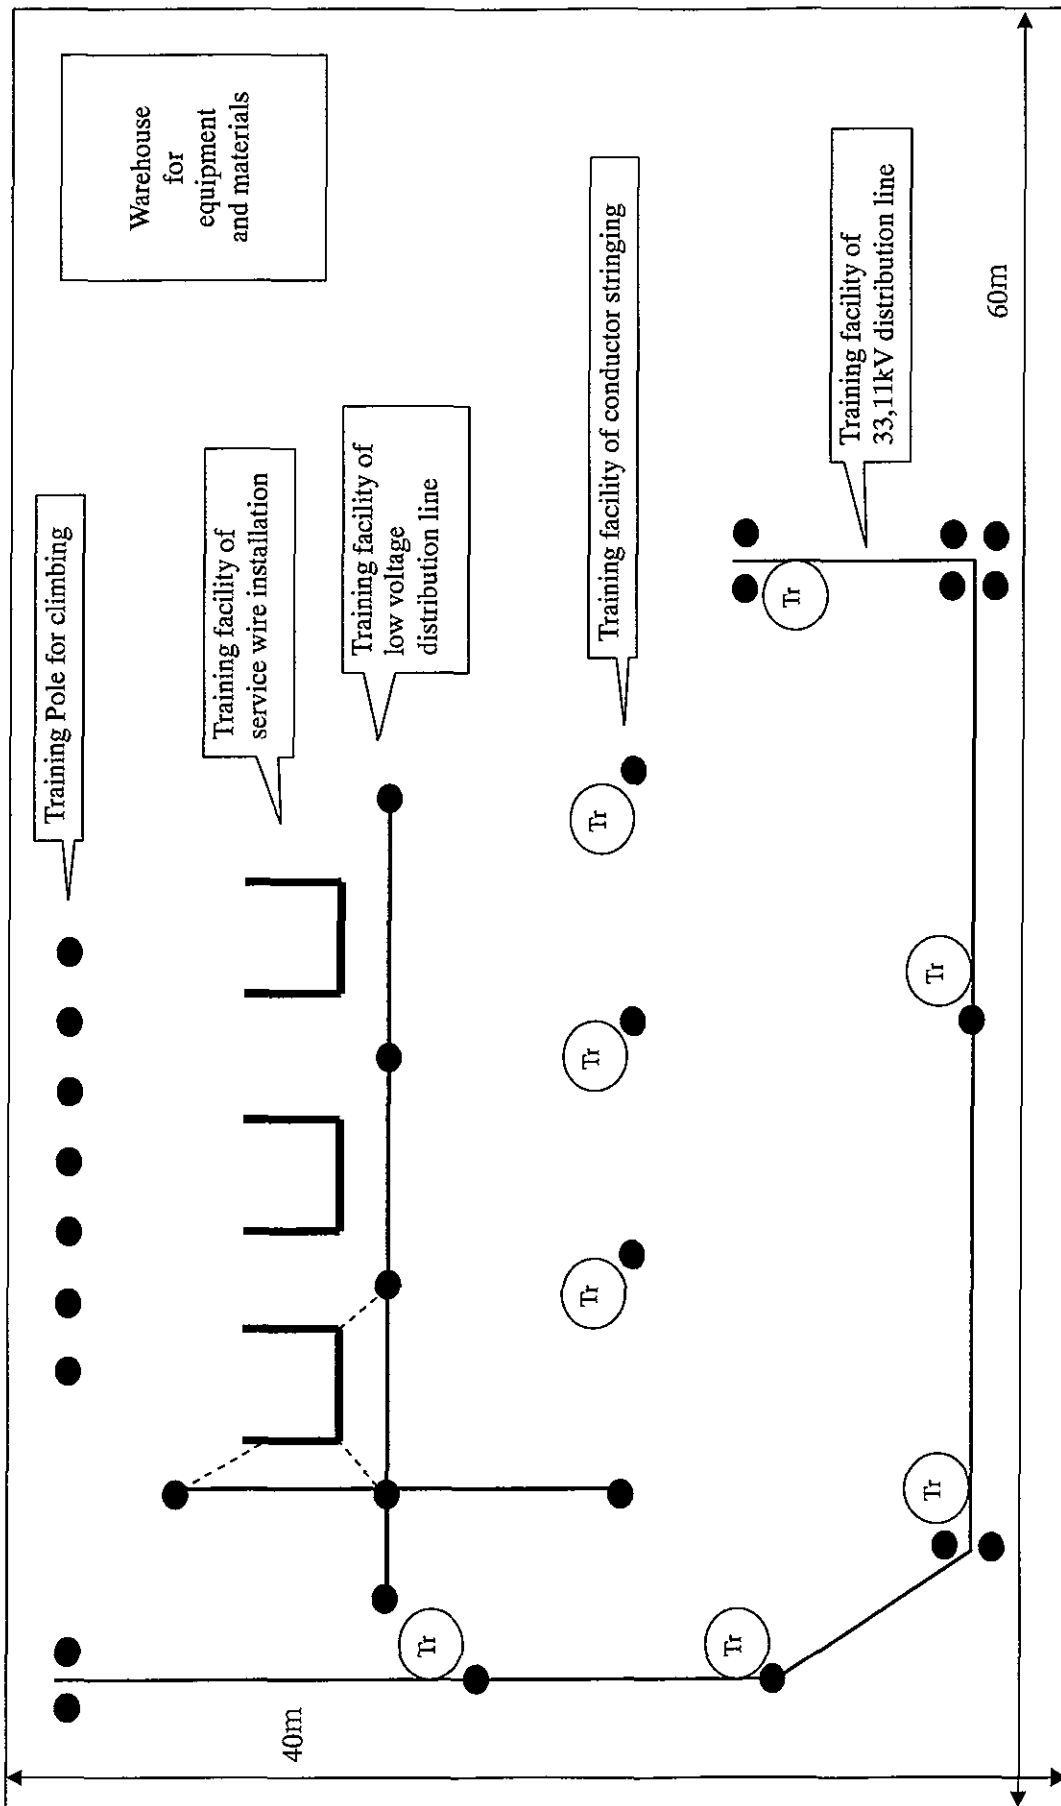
Layout of LSTC Outdoor practical training facilities of distribution network (draft plan)
